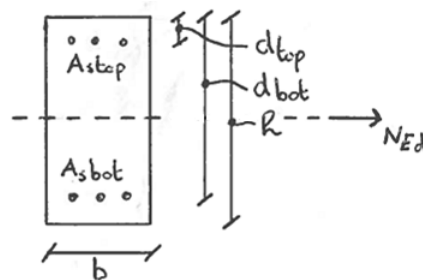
rectangular doubly reinforced concrete beam + normal force
